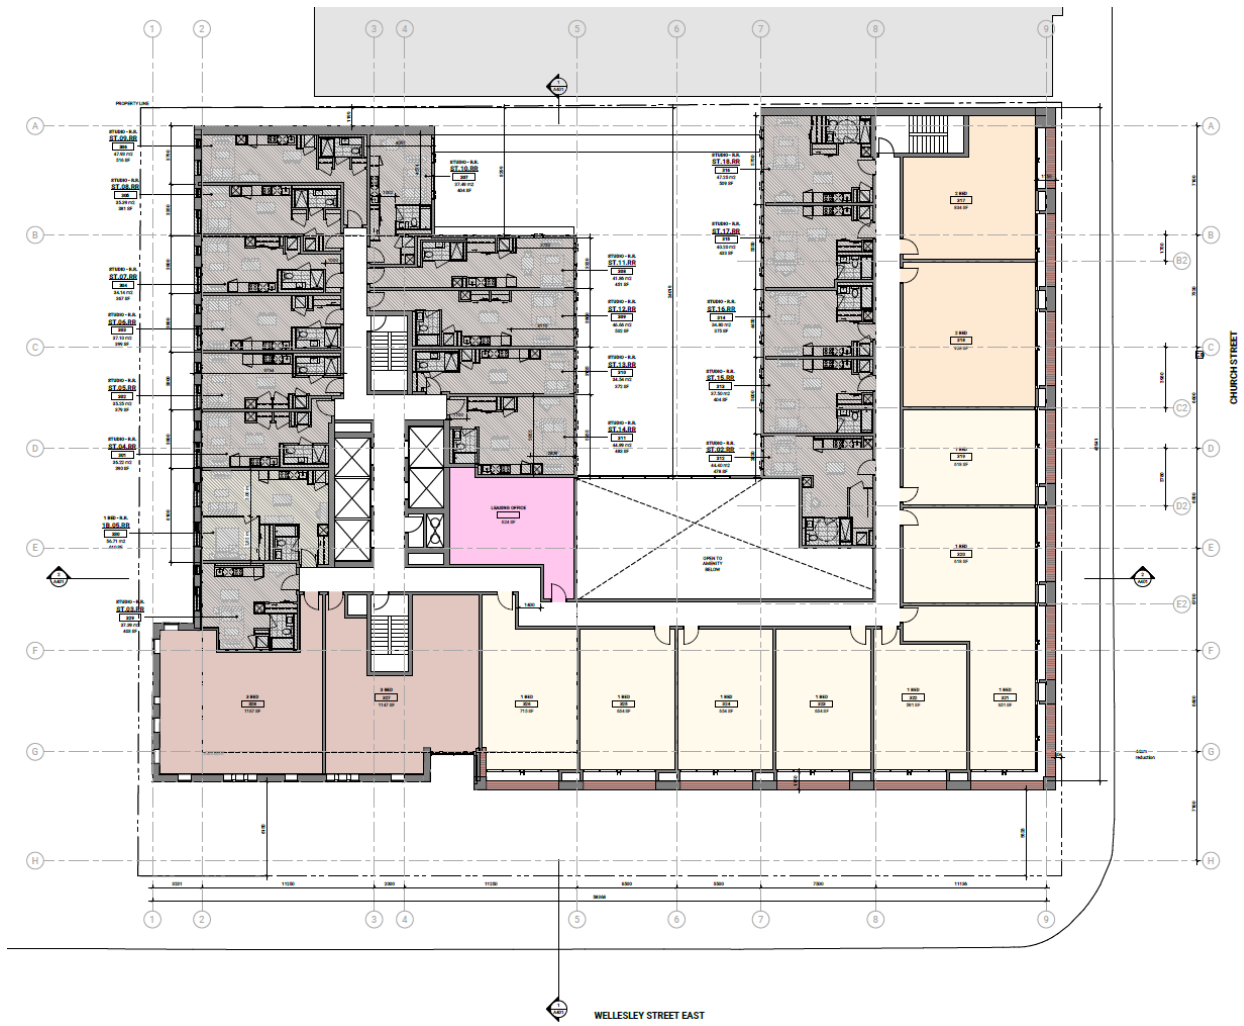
Level 3 floor plan for 64 Wellesley Street East included for illustration purposes (ERA Architects Inc., March 3, 2026).
